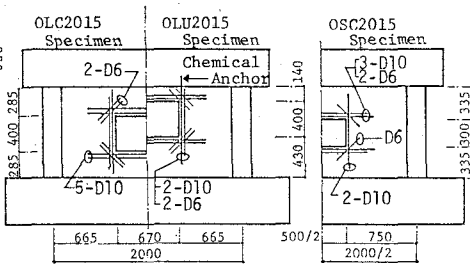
DIMENSIONS AND REINFORCEMENT OF OPENING
